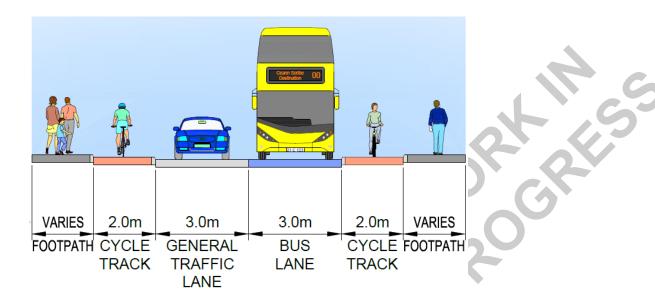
Section 2, Proposed Option 6 - Cross Section A-A
